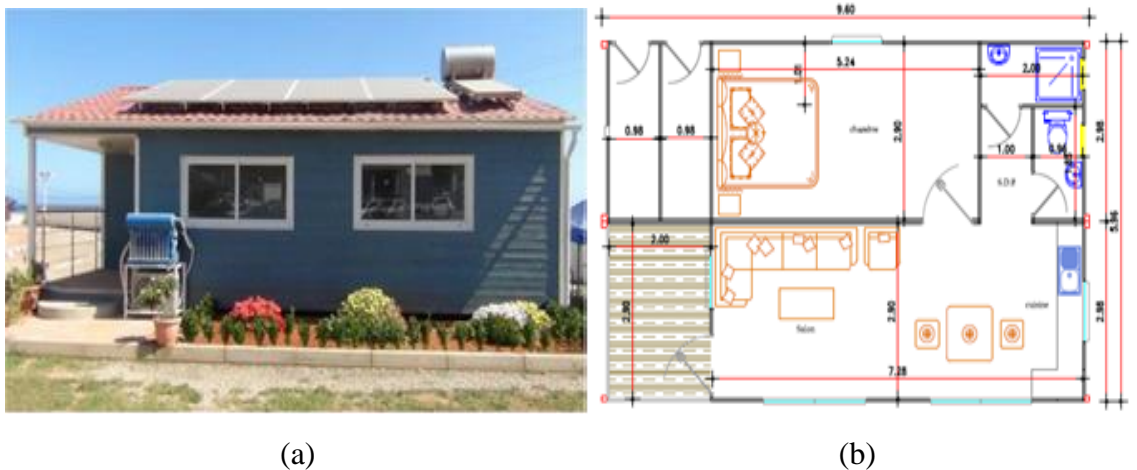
Solar smart house of UDES-Bou-Ismail, (a): Outside view, (b): house plan
